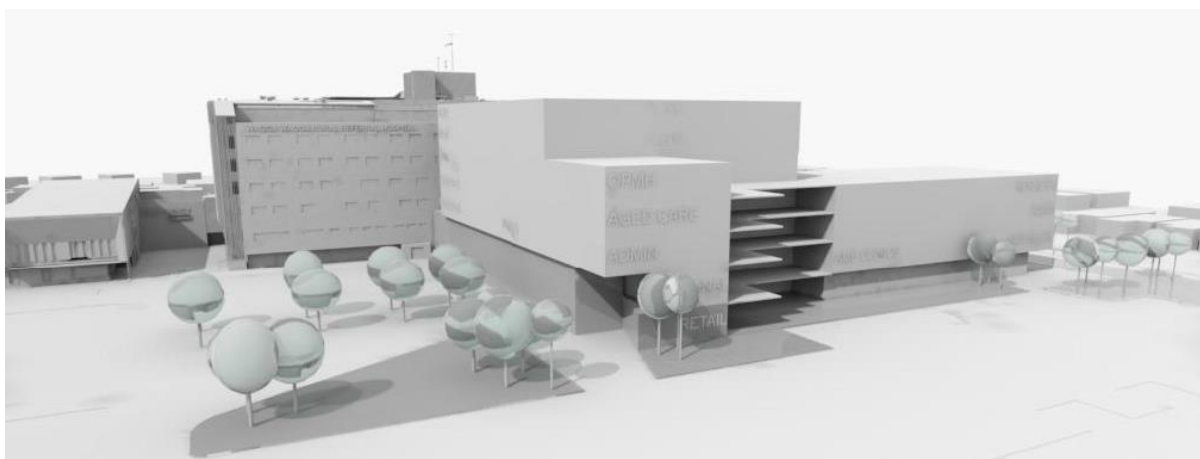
Proposed Stage 3 Massing Plan – North East Perspective (Source: Martin and Ollmann Architects)
